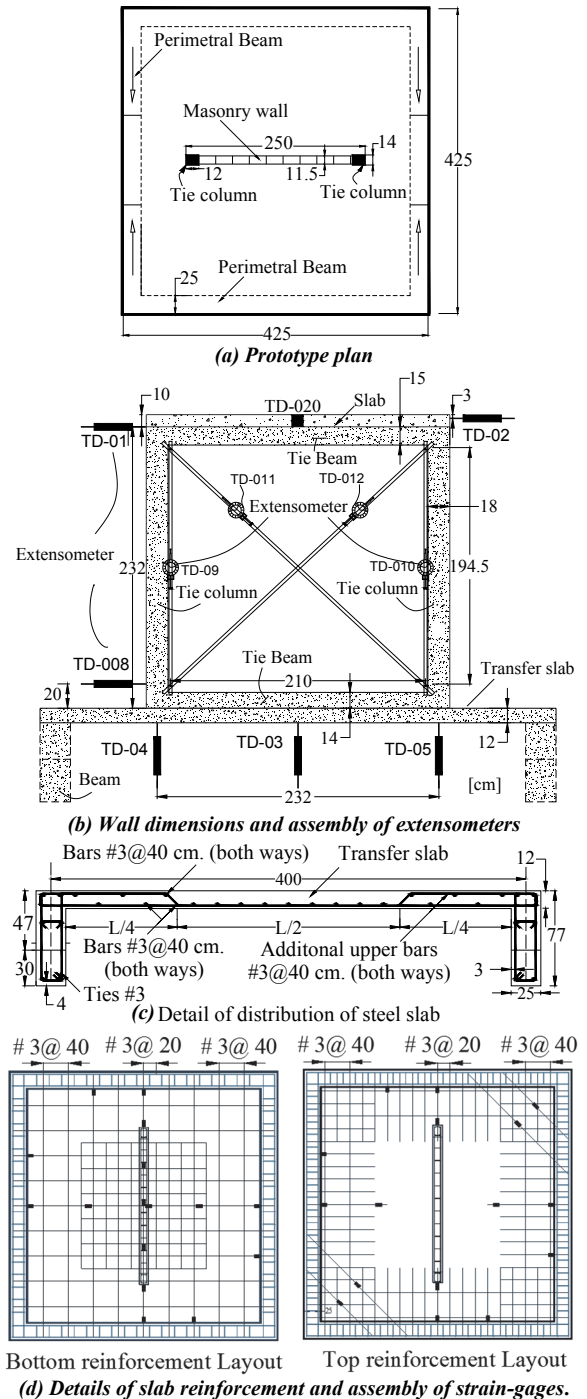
Geometry and details of Slab-Wall specimen. Source: The Authors
